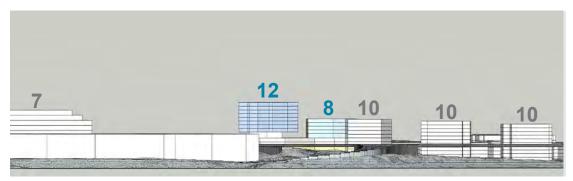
South-eastern View: Planning Proposal with proposed building heights in storeys
